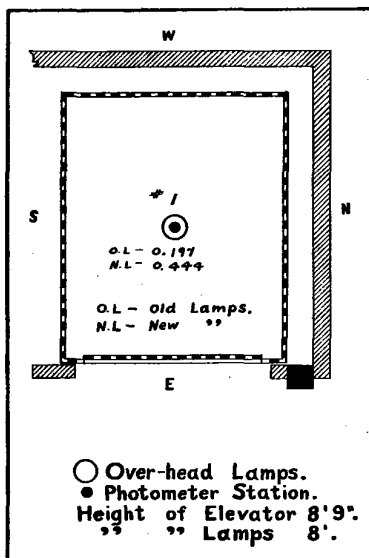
Section plan showing elevator No. 41 with location of lighting units, test stations and illumination data.
